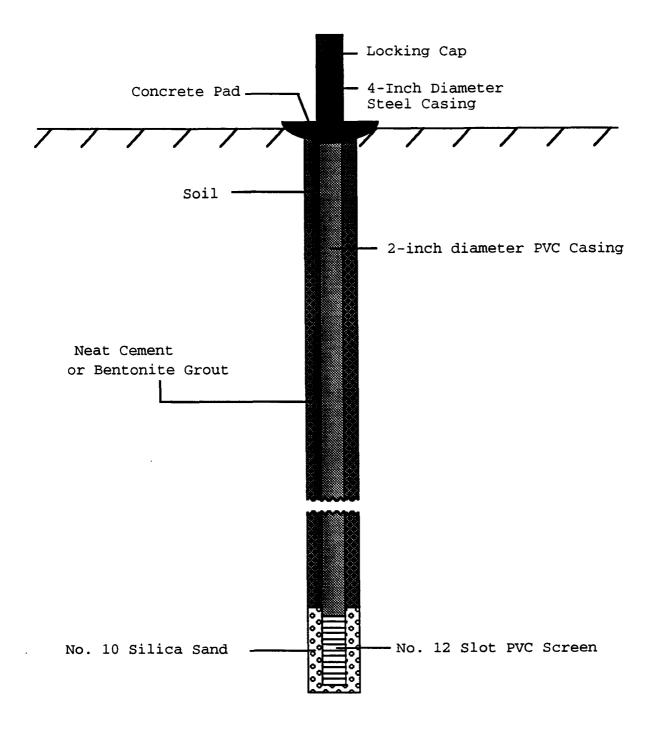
Construction design used for monitoring wells installed at the Bauer landfill.
